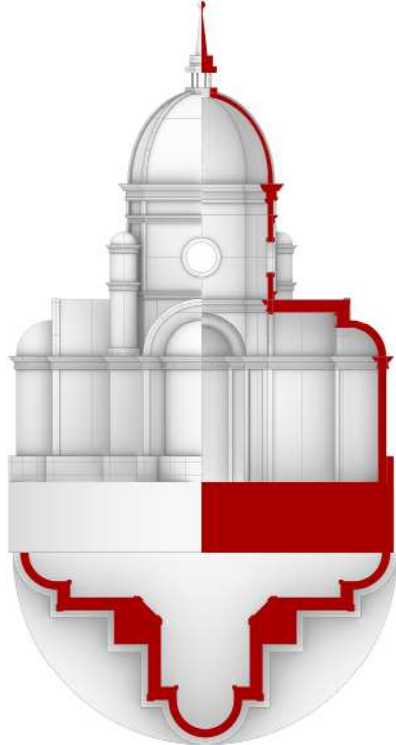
Plan, section and elevation (1:500) of the solution with a smaller diagonal side of the drum and a cloister dome.
